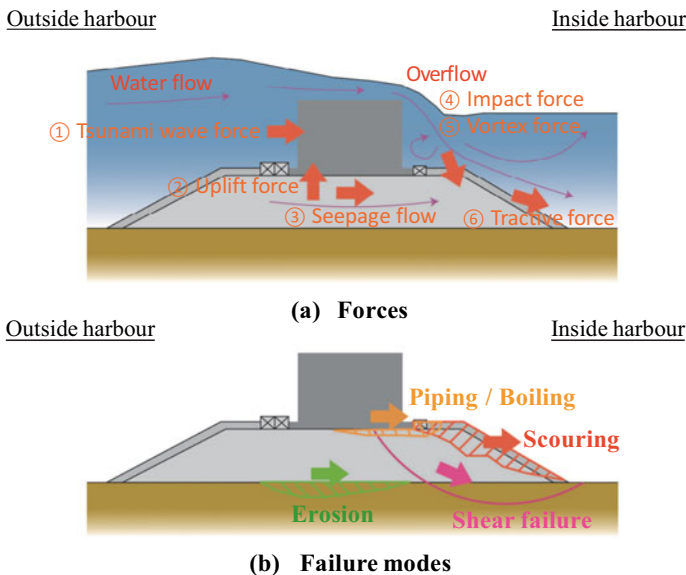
Tsunami-induced forces on caisson breakwaters and failure modes of the foundation. Descriptions are added to Fig. 1 of [7]
